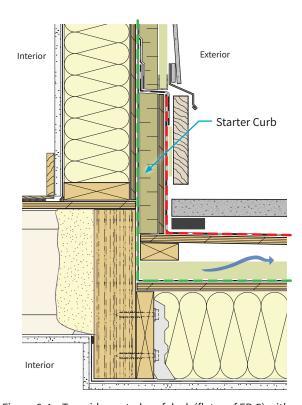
Top-side vented roof deck (flat roof FR-5) with a starter curb at the base-of-wall to allow roof service work without affecting the continuity of the air barrier (green dashed line).
